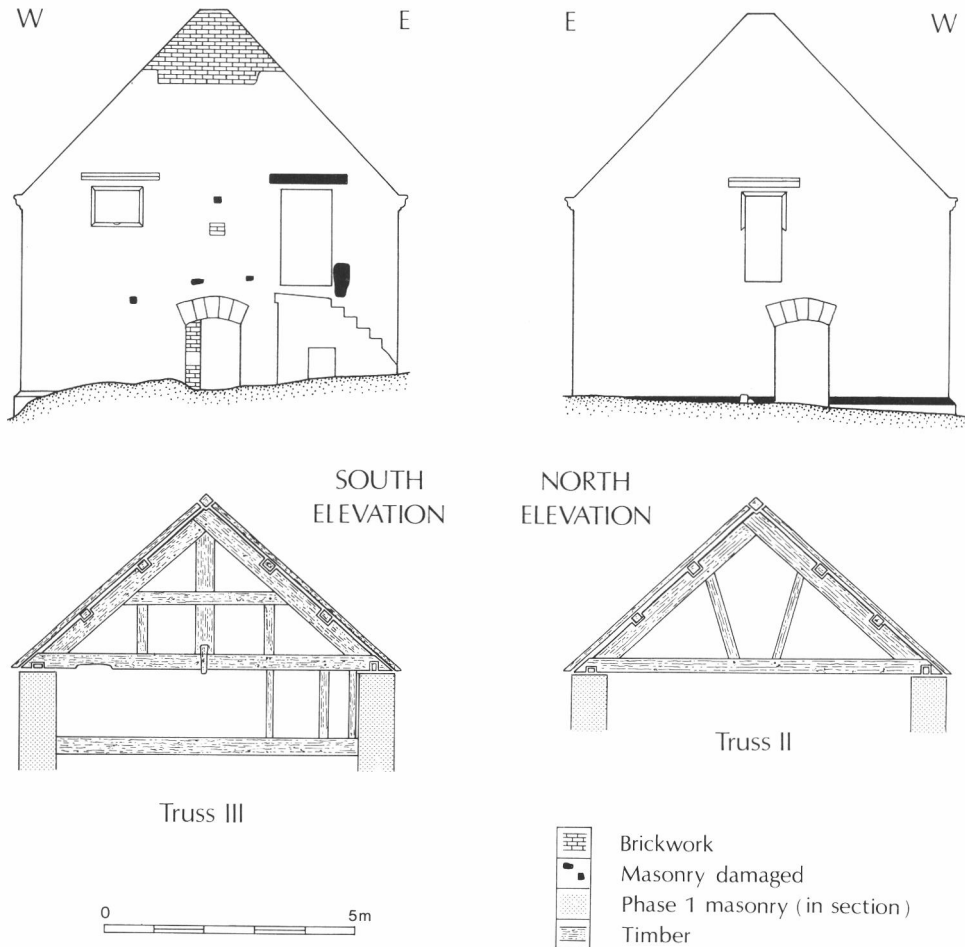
Norbury Mill: north and south elevations; internal partition and roof trusses II and III.
